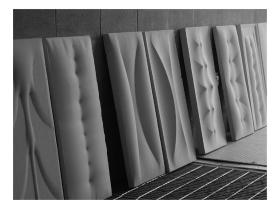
Completed plaster cast wall panels (C.A.S.T. photo).
